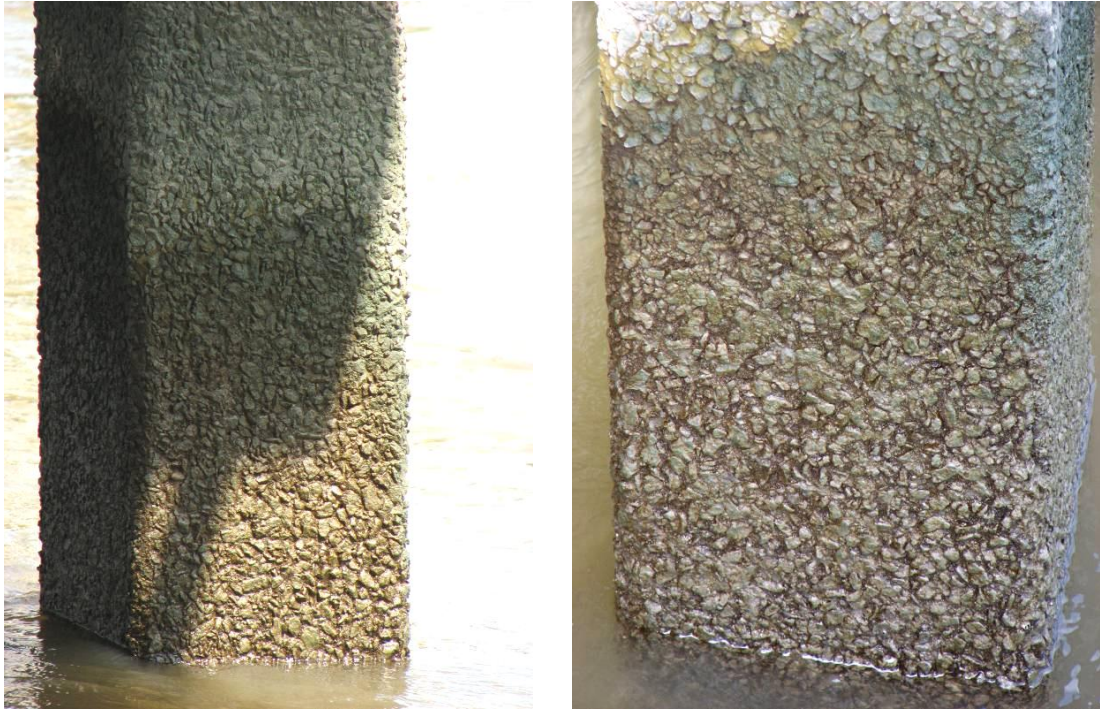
Surface abrasion of concrete substructure on Houlihan Bridge
